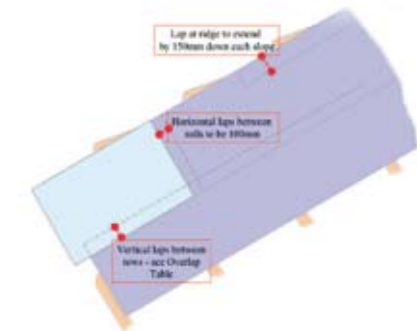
Daltex® Roofing Underlay: Overlap Detail
